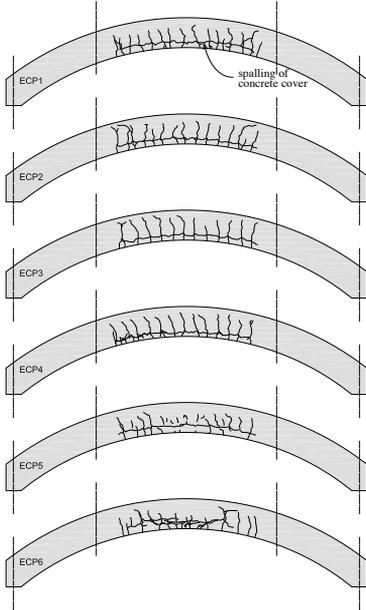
Cracking pattern at failure of tested specimens (Fernández Ruiz et al. 2010), all failures by spalling of concrete cover.
